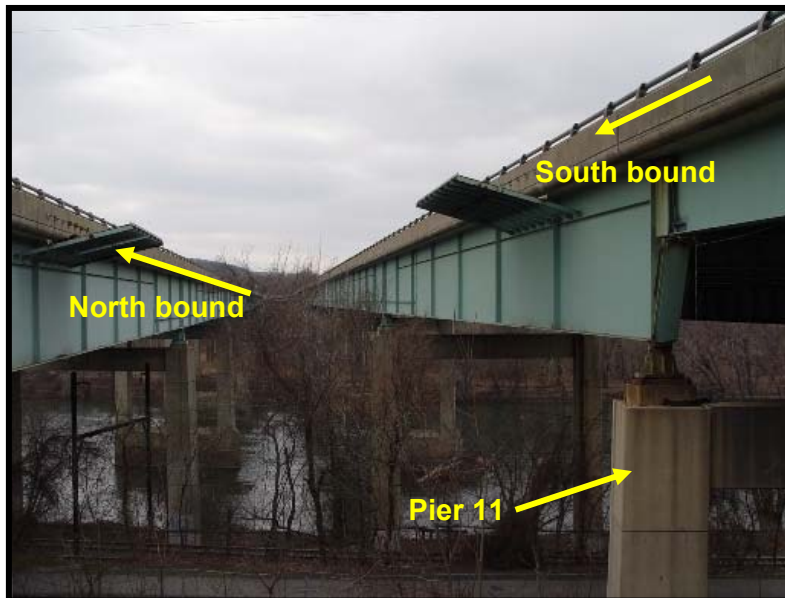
Elevation view of the north bound and south bound bridges over the Schuylkill River
